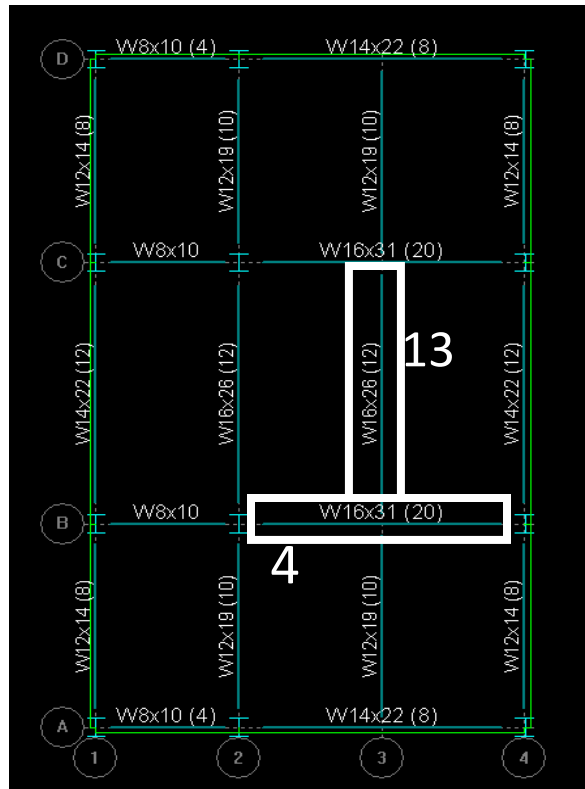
Typical bays analyzed in Ram Structural System. Beams with white boxes are beams with report on next page
